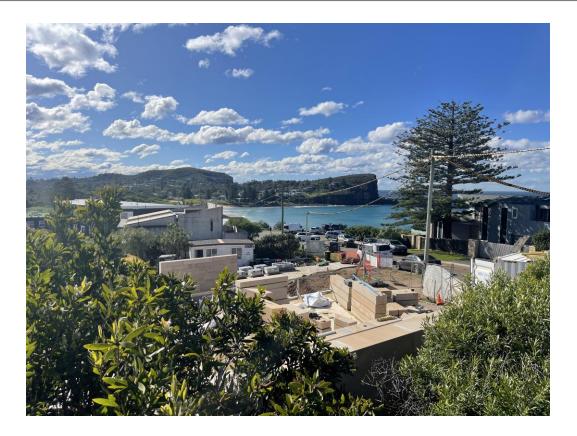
View from the subject site, looking north towards the neighbouring development under construction, and the nearby dwelling at No 11 Surfside Avenue, with a similar rooftop terrace
